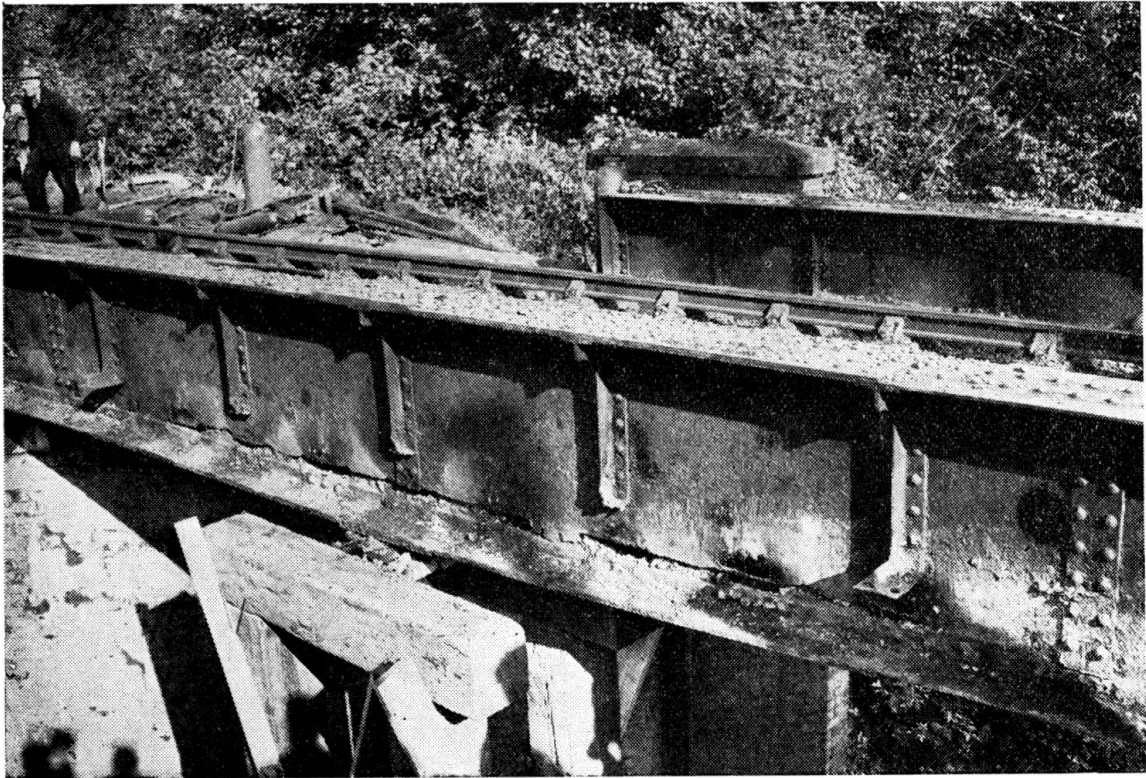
The failure of a plate girder caused by corrosion fatigue of the mild steel web which had been obscured by concrete haunching. The decking on the nearside of the girder had been removed before this photograph was taken
